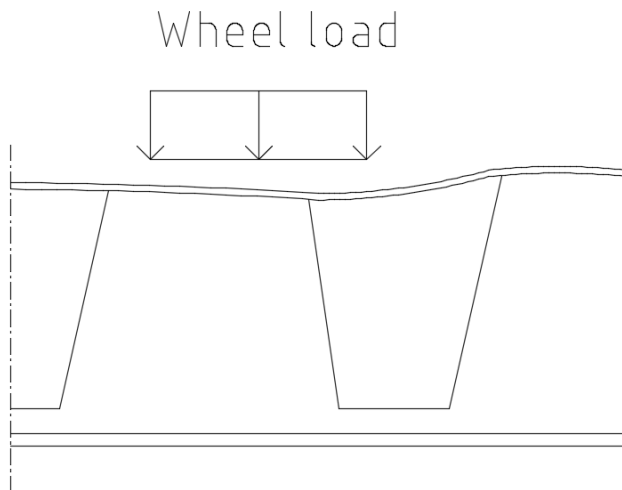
Vertical distortion of cross beam due to wheel load.
